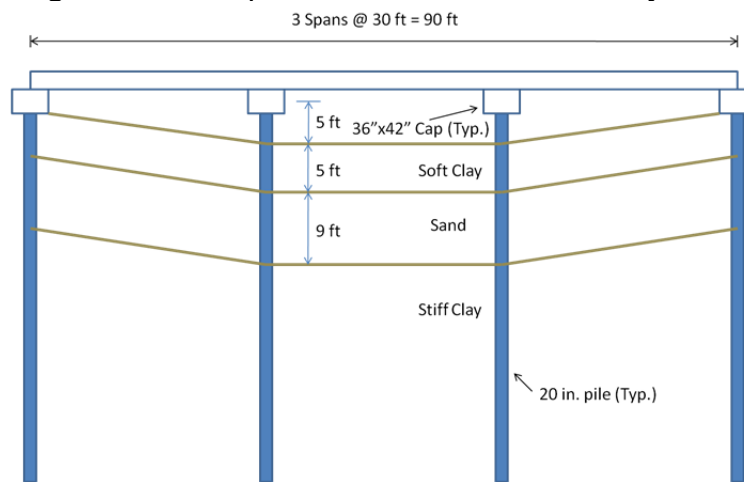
Example Bridge Elevation showing Three Span Continuous Slab
